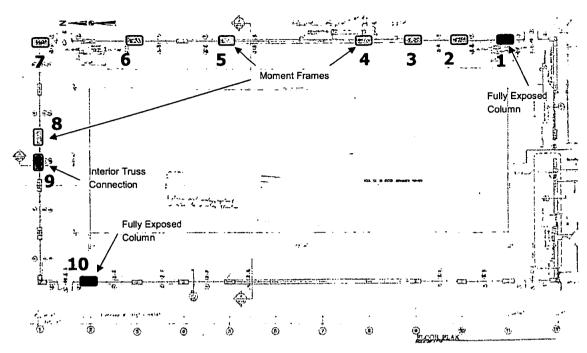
Floor Plan Showing Locations of Columns Evaluated
